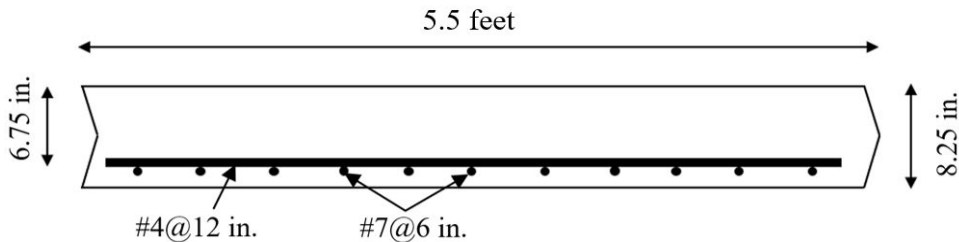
Dimensional information and reinforcing details of 15-foot flat slab specimens.
